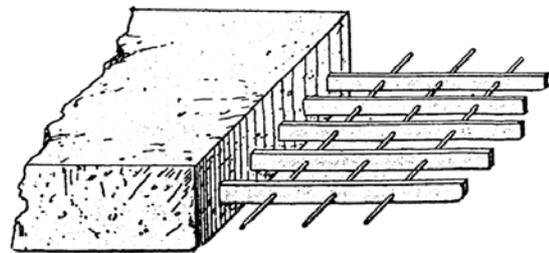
'Fireproof' reinforced concrete floor design, Hyatt, c.1875. (Bosc)
